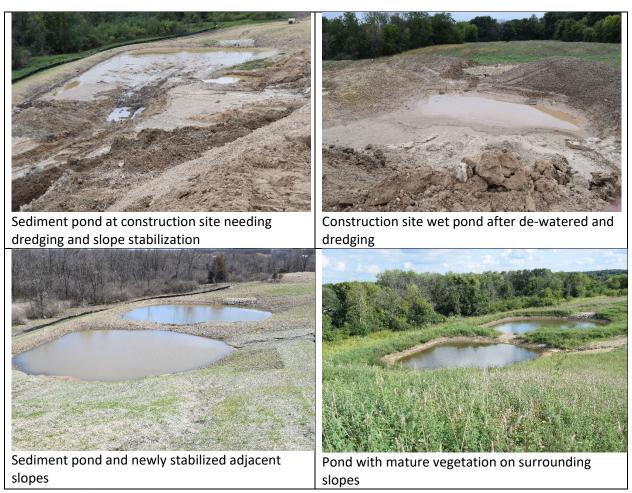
Different phases of a wet pond at a construction site converted to a permanent stormwater pond (J. Voorhees photos).
